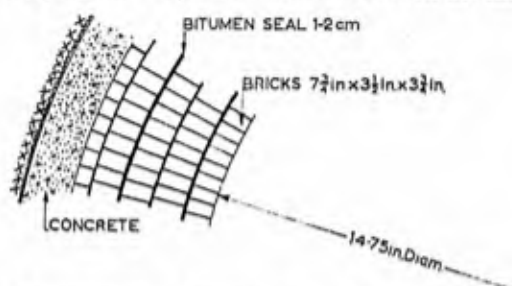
ARRANGEMENT OF BRICKWORK AND CONCRETE LINING SHOWING POSITION OF BITUMEN SEAL (N.C.B. BULLETIN)
